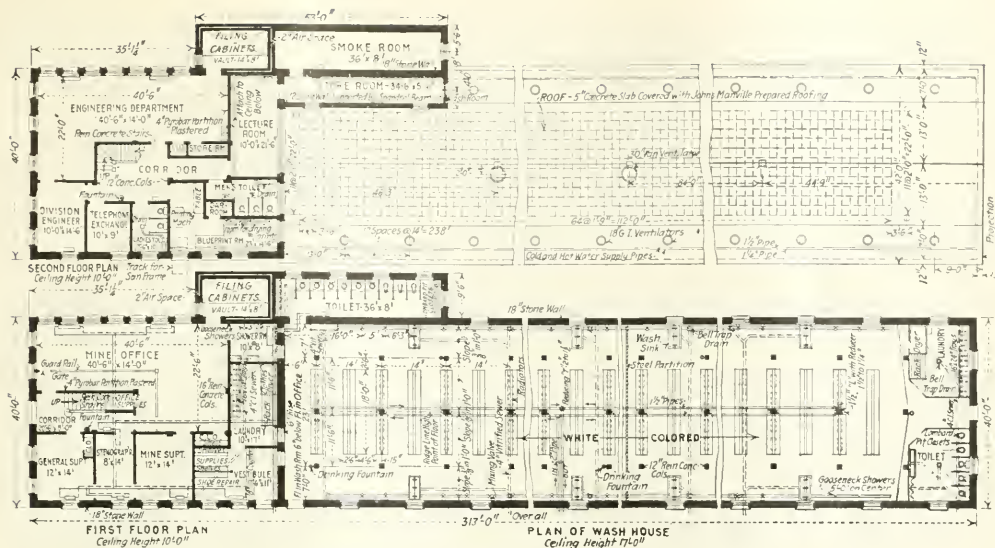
PLAN OF BUILDING SHOWN IN ELEVATION IN FIG. 1
